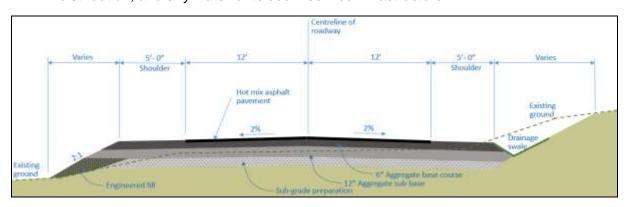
Typical road cross-section. Based on the design standard developed for Kosrae circumferential road extension project (Barret Consulting Group Inc., 1987).
